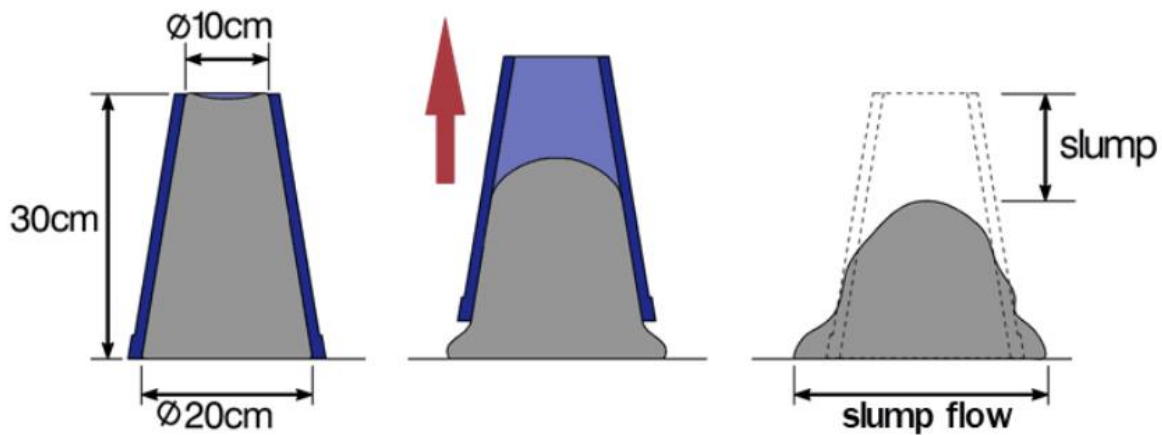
CONCRETE SLUMP TEST (CEMENTCONCRETE.ORG 2020)
